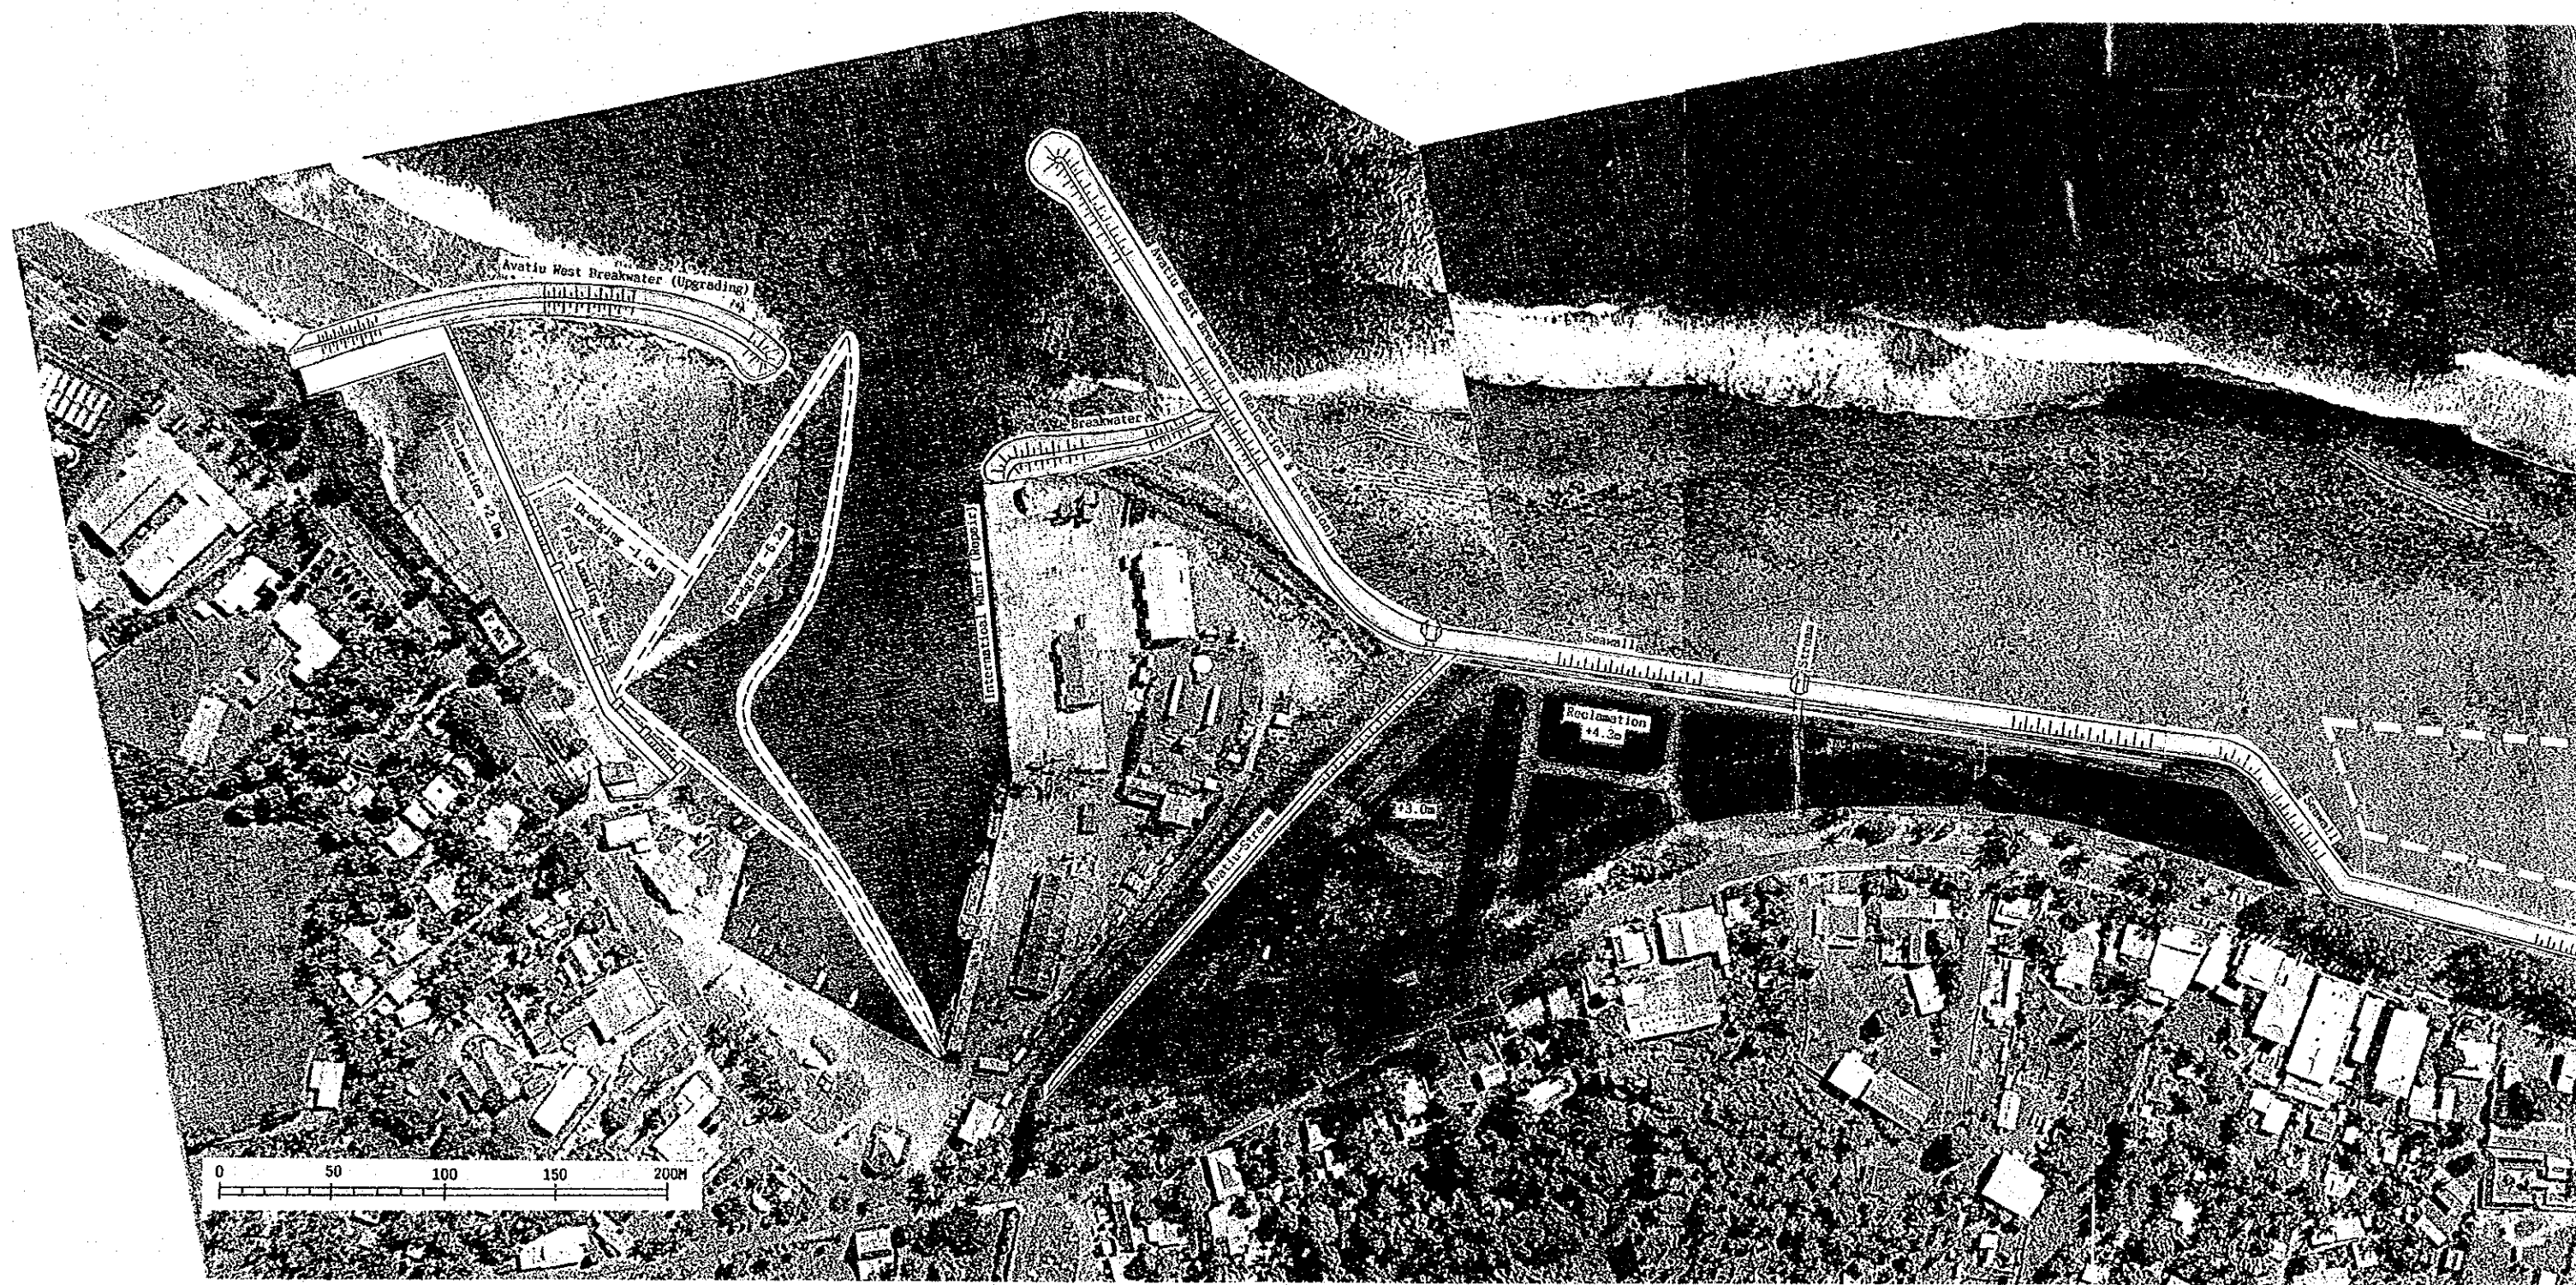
Short-Term Development Plan for Coastal Protection and Port Improvement at the Avarua/Avatiu Coast (Site-2) Rarotonga, Cook Islands
